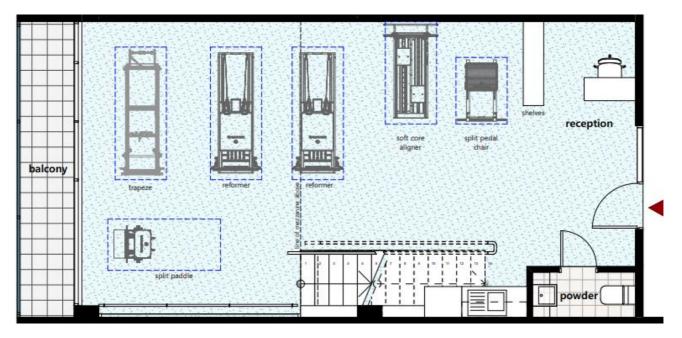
Existing and Proposed Ground Floor (Source: Council Approval Group)
